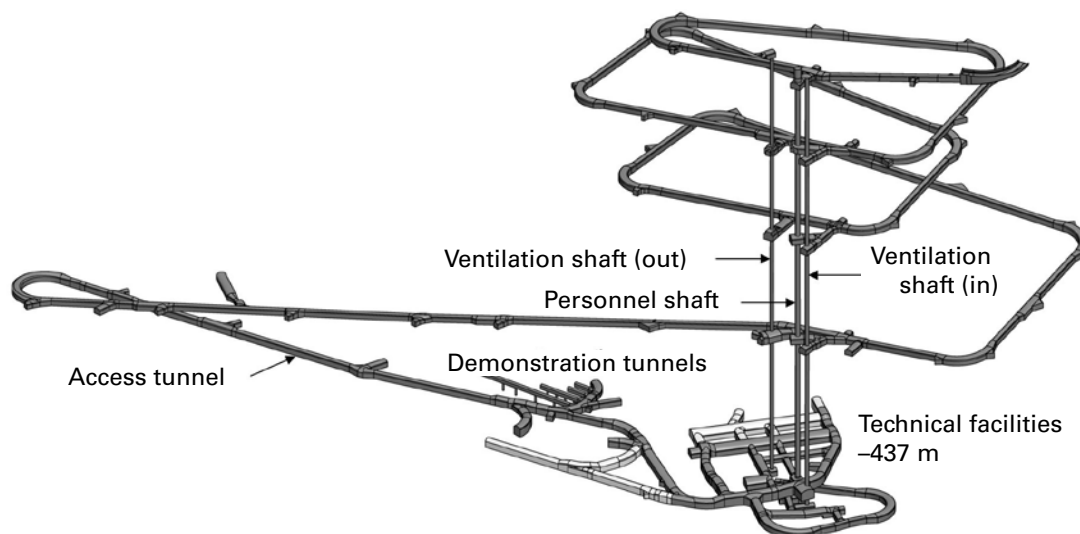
Status of the excavation of Onkalo in January 2015. Lightgray parts denote Posiva's excavation plans for 2015.
